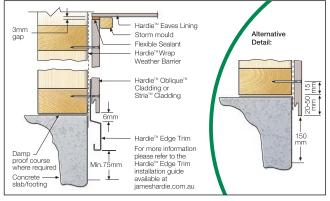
SLAB/EAVE JUNCTION DETAIL
